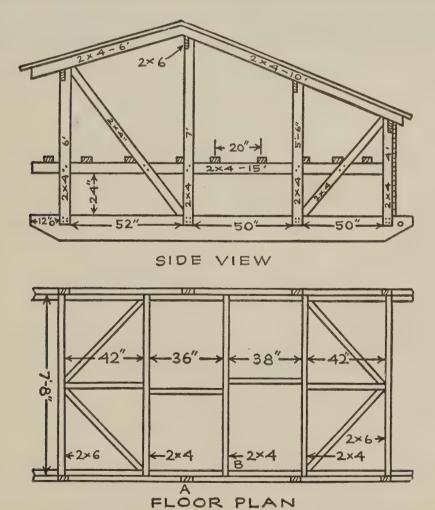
The side view and floor plan of $8' \times 15'$ range shelter shown in Fig. 82. (R. R. Murphy, Pennsylvania State College.)
